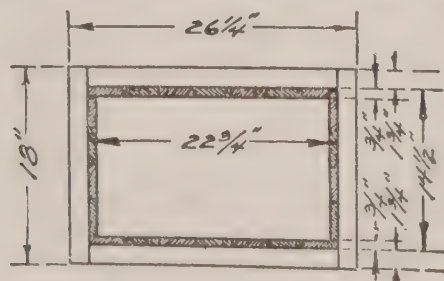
Suggested wood-floor wood-riser pit privy with floor constructed on sills independent of curbing. (From Supplement No. 108, P. H. Reports.)
